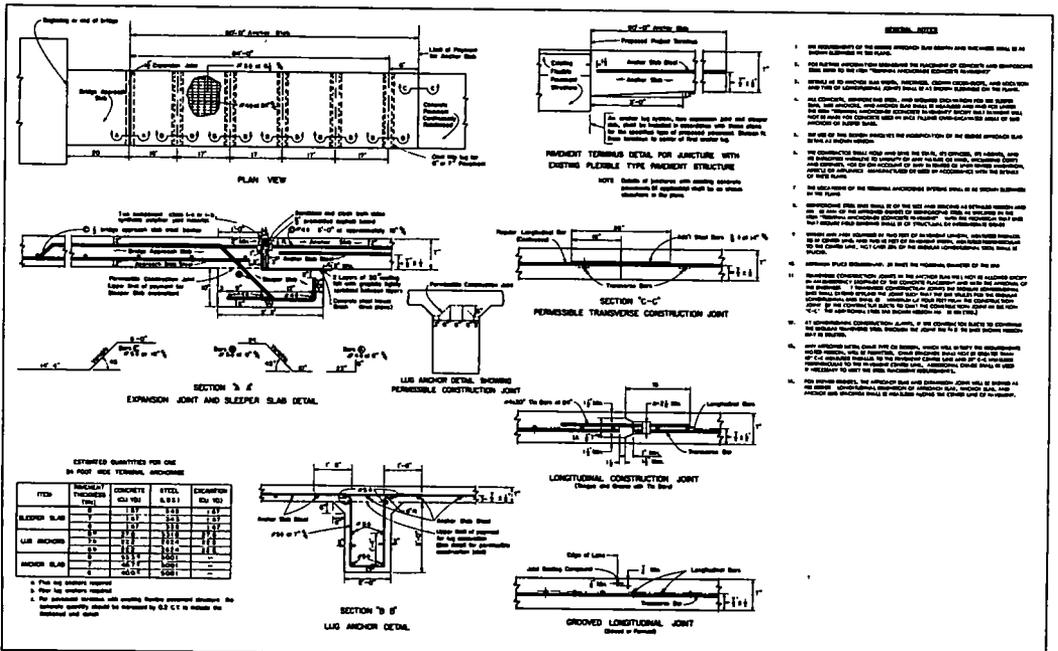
Terminal anchorage for concrete pavement continuously reinforced, TA(CPCR)-61, Texas Highway Department.
